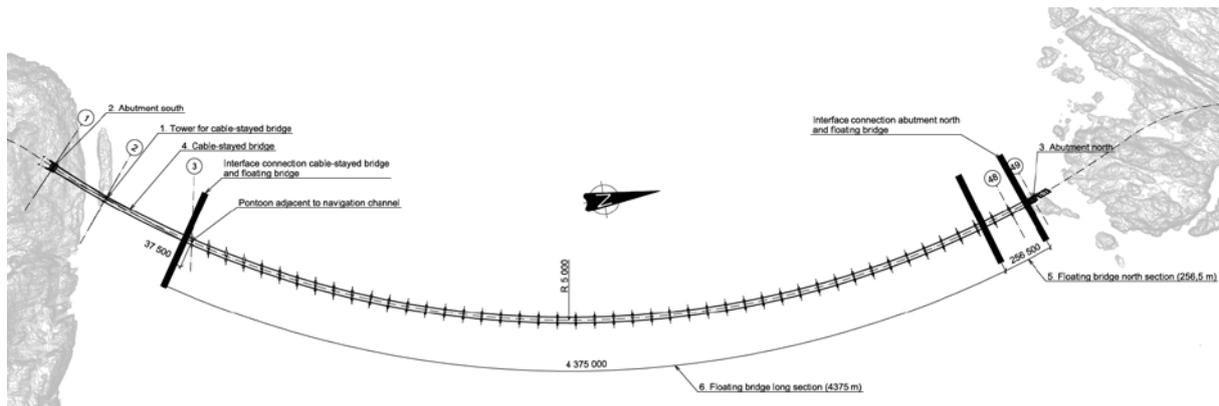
Overview end anchored floating bridge – installation sequences extract from –DR-100, appendix A
